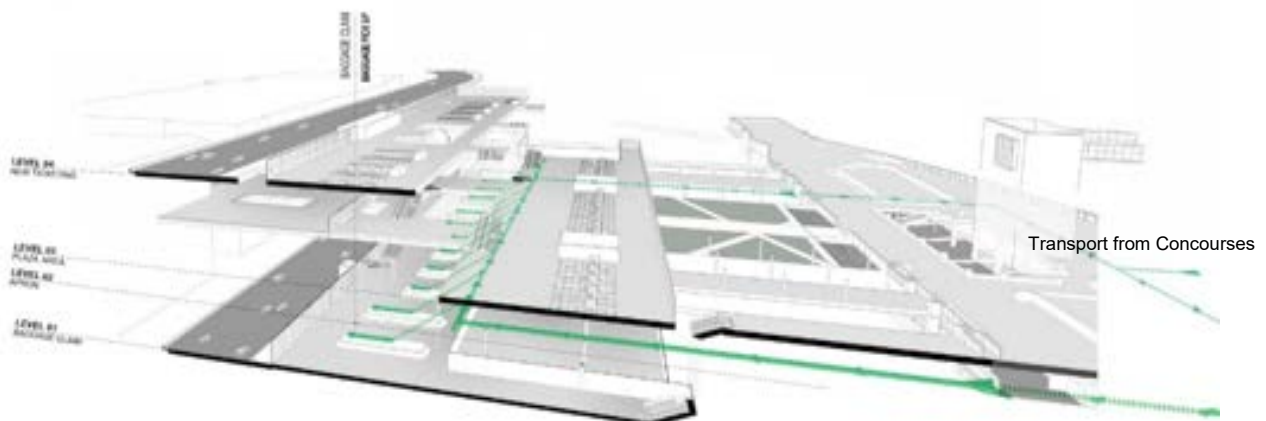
Baggage Handling System Diagram – Departures
